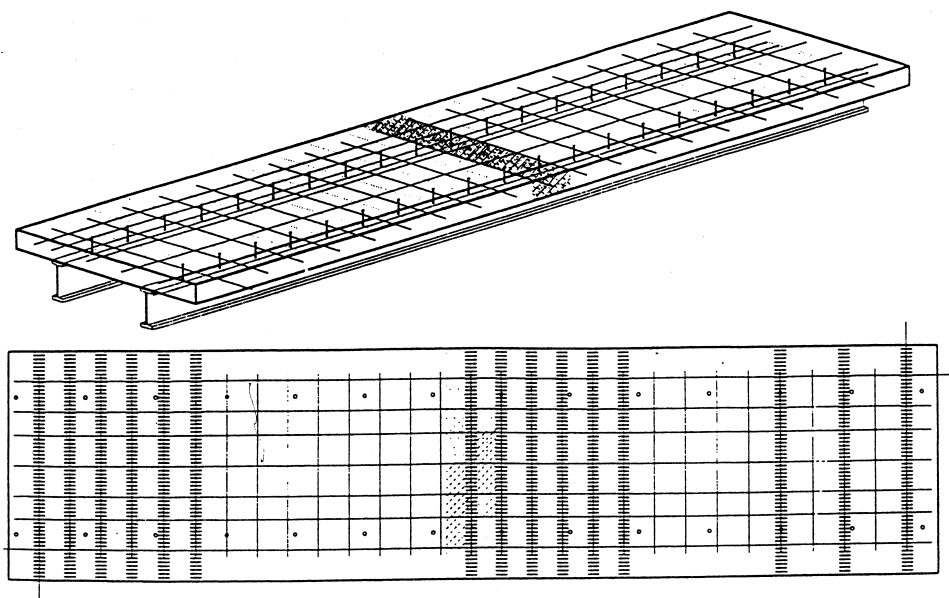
A drawing of the top surface of the 4 × 20-ft decks into which repair tubes were embedded [3].
